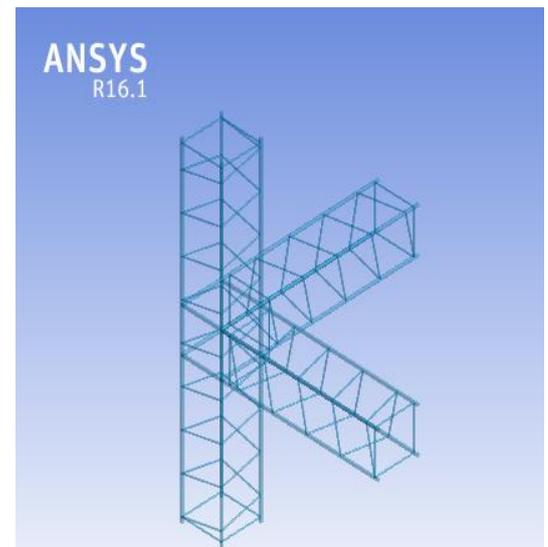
Reinforcement model having rectangular spiral stirrups.
